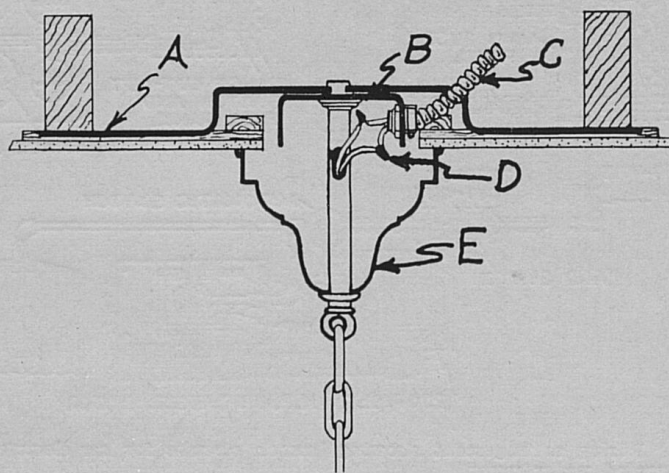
Cross section of a ceiling-light outlet. A. Mounting or metal strap fastened to ceiling joists. B. Outlet box. C. Flexible conduit. D. Soldered and taped wire splices. E. Canopy of pendant lamp fixture.
